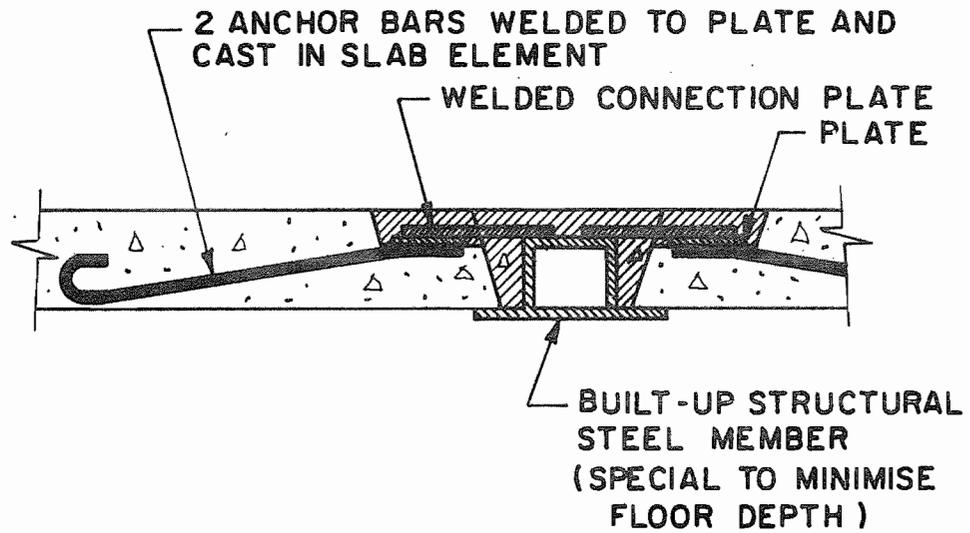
DETAIL OF A FULLY CONTINUOUS FLOOR PANEL SUPPORT JOINT
